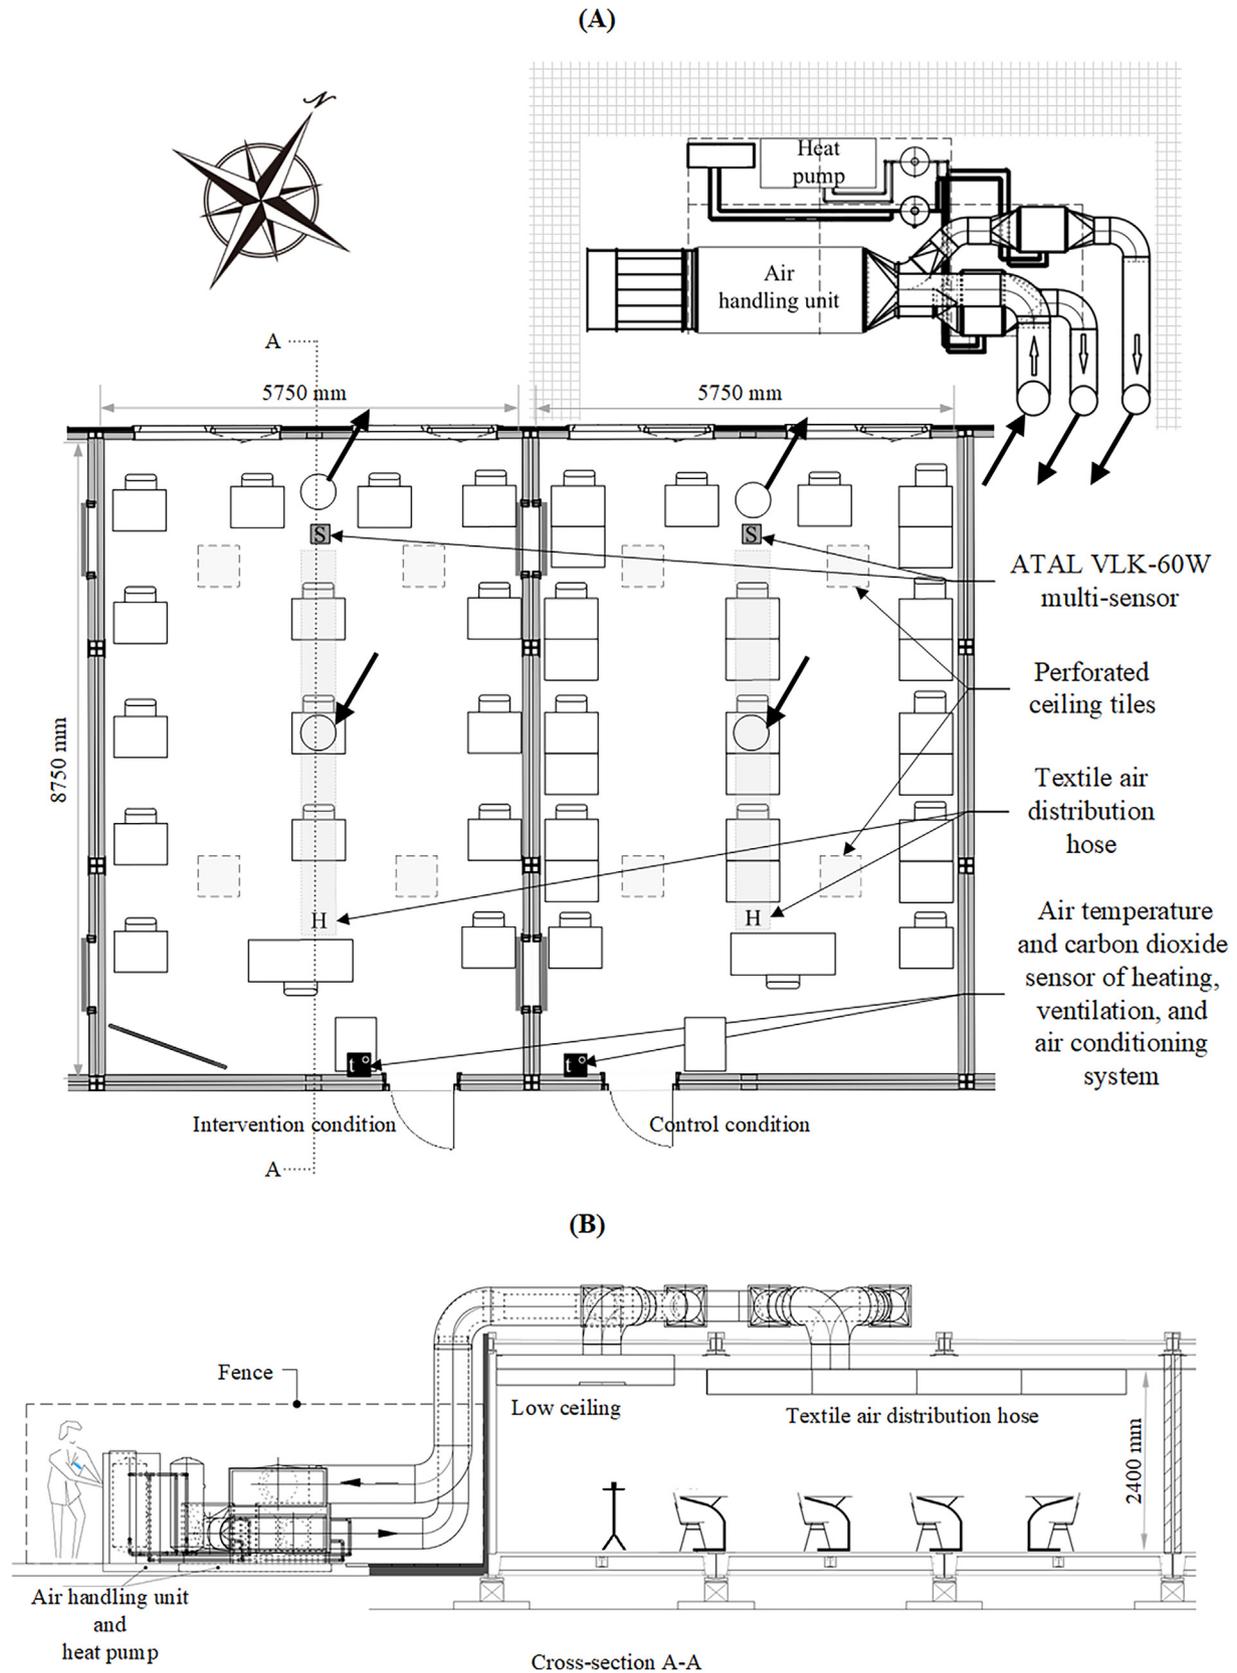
(A) Layout of the intervention and control conditions, including the orientation and technical details of the HVAC system and (B) cross-section of the intervention condition.
